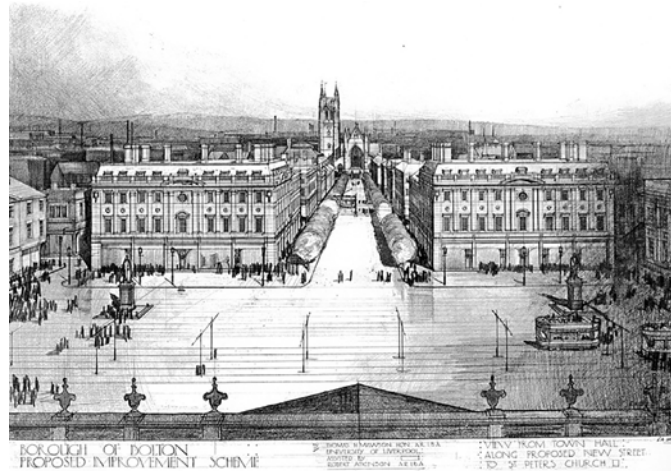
View From Town Hall Across Proposed Street Towards St Peter's Church. Mawson, Thomas H. 1910.
